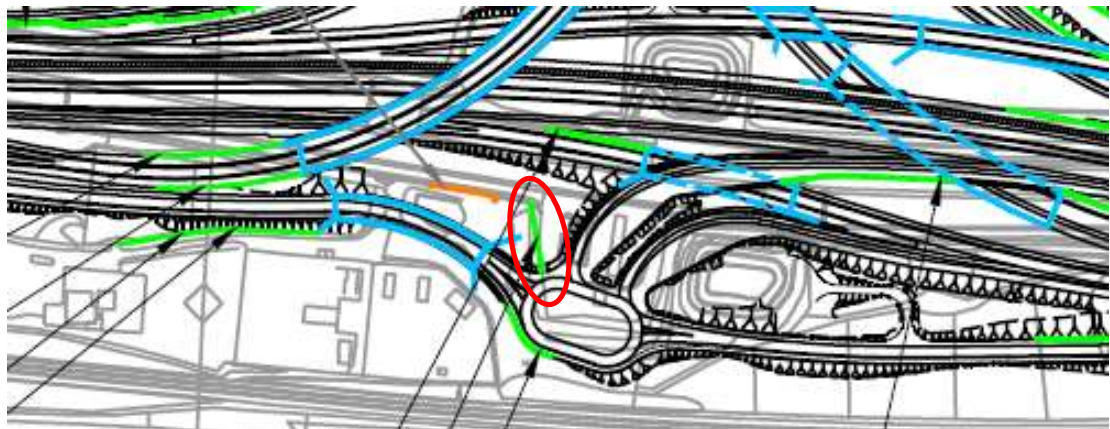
EXTRACT FROM RETAINING WALL STRUCTURES DRAWING HE540039-CJV-SGN-SZP_STZZZZZZZ-DR-CB-28072
